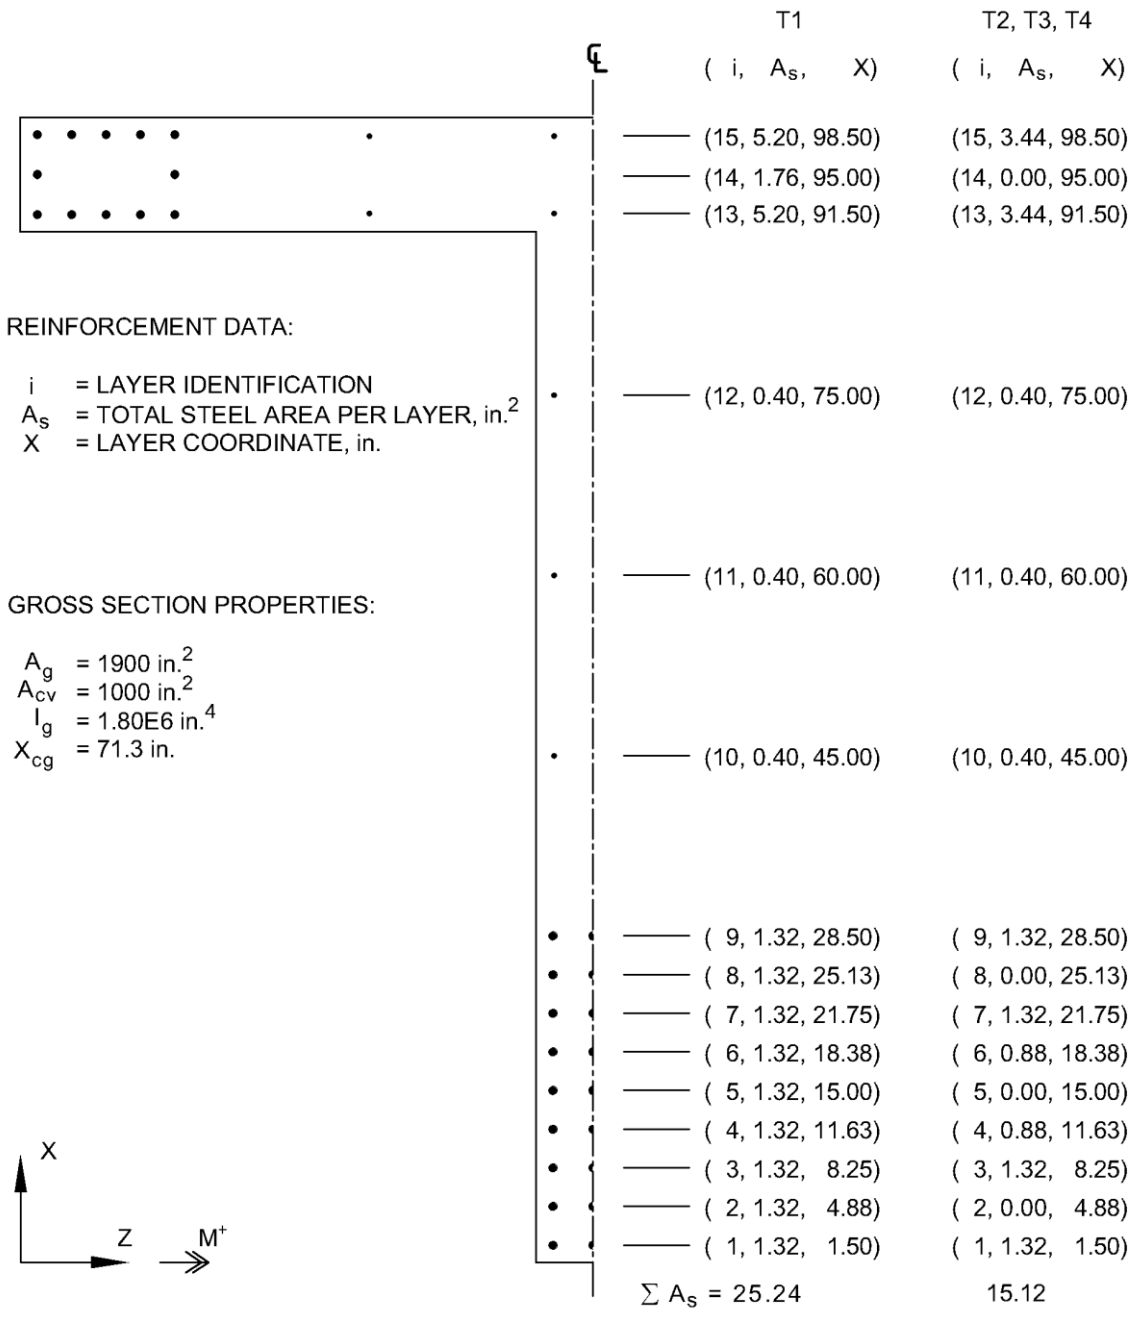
Reinforcement data and wall section properties (1 in. = 25.4 mm)
